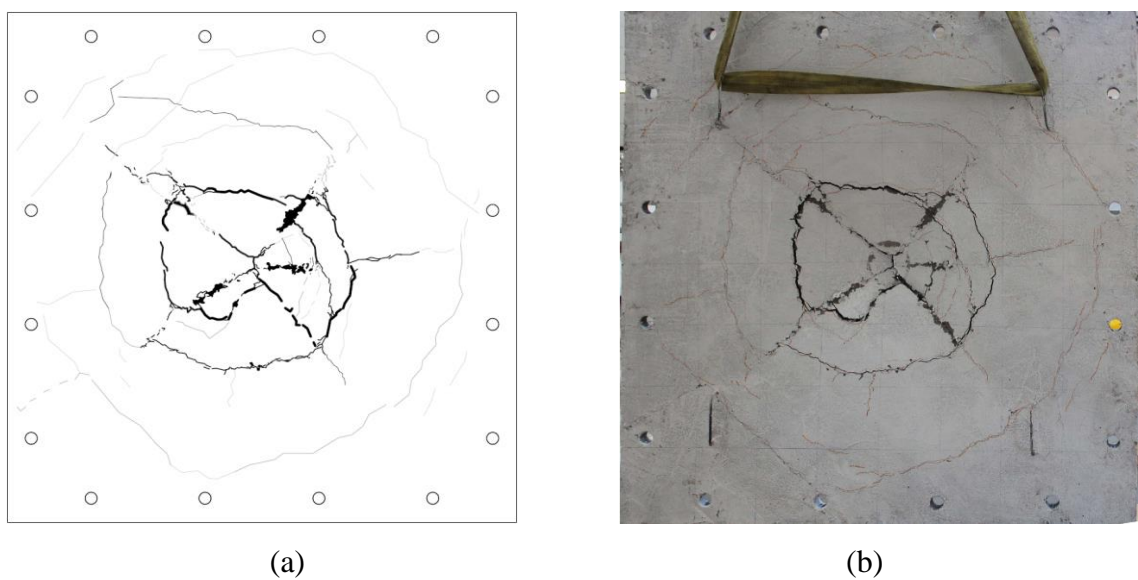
Top surface crack patterns after testing for panel JN1-075
